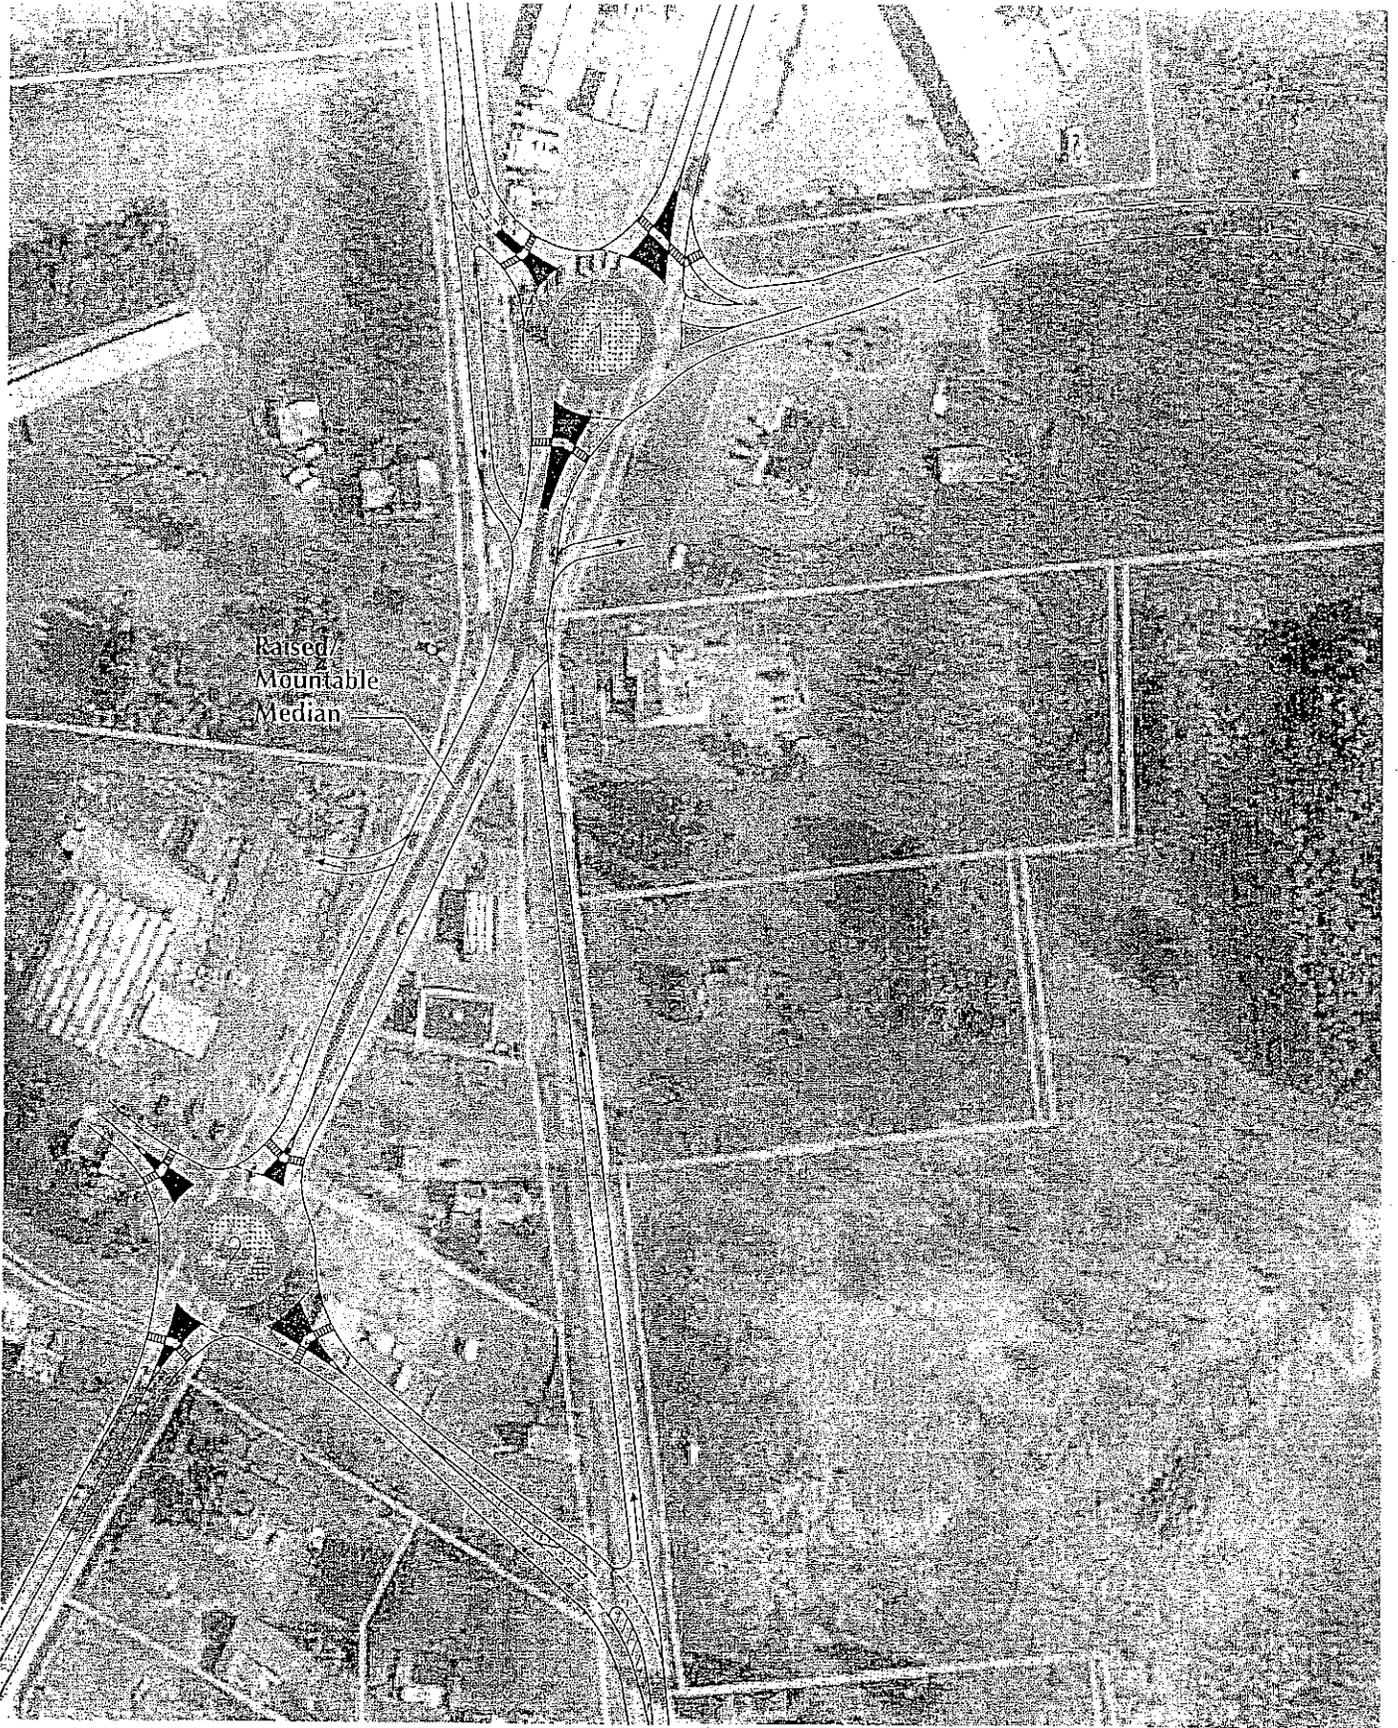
PROPOSED ROUNDABOUTS AT V-CORNERS
